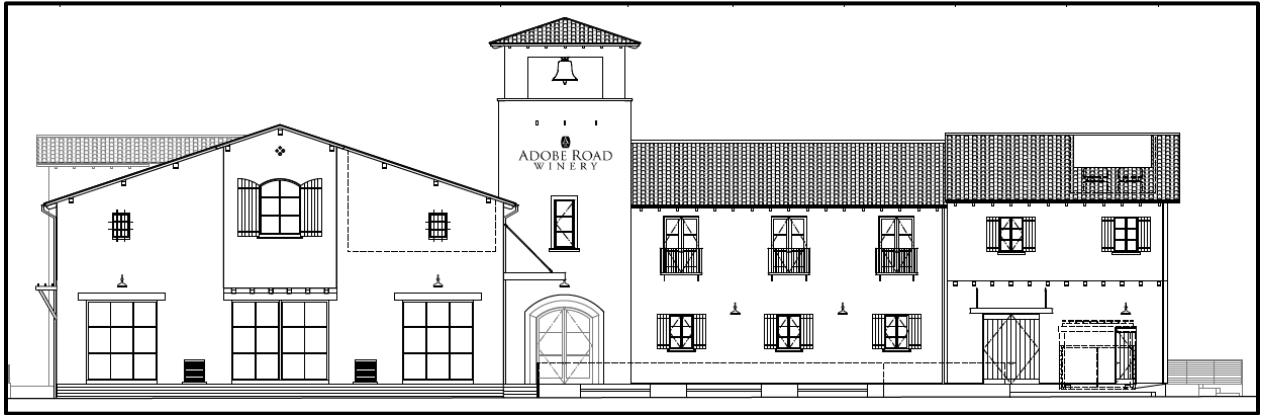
First Street Elevation – Approved (Attachment F, Sheet A3.01)
